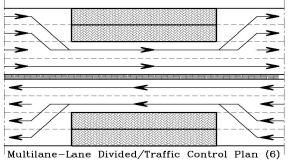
5 Suggested Bridge Traffic Control Plans (TCP)
